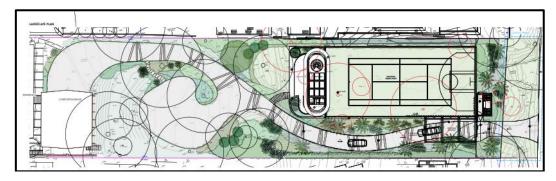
Proposed Landscape Plan (Source: Dangar Barin Smith, August 2021)
